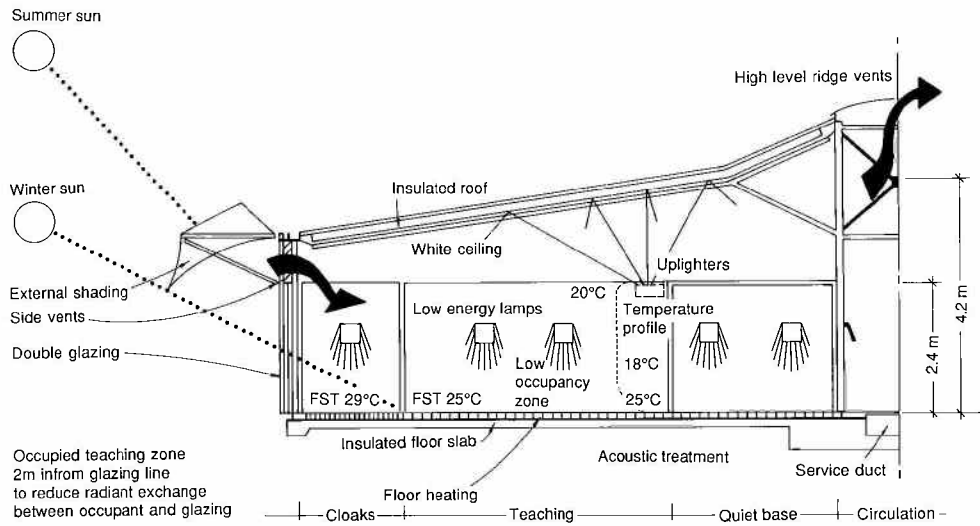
Environmental section showing solar shading, and ventilation patterns
